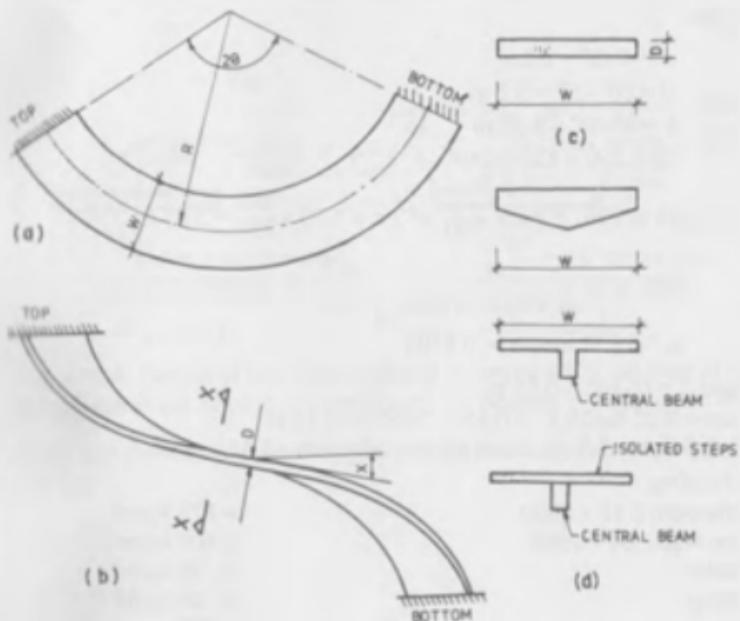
Helicoidal stairs. (a) Plan of helicoidal stairs; (b) Elevation of stairs; (c) Section X-X; (d) Alternative sections of stairs.
